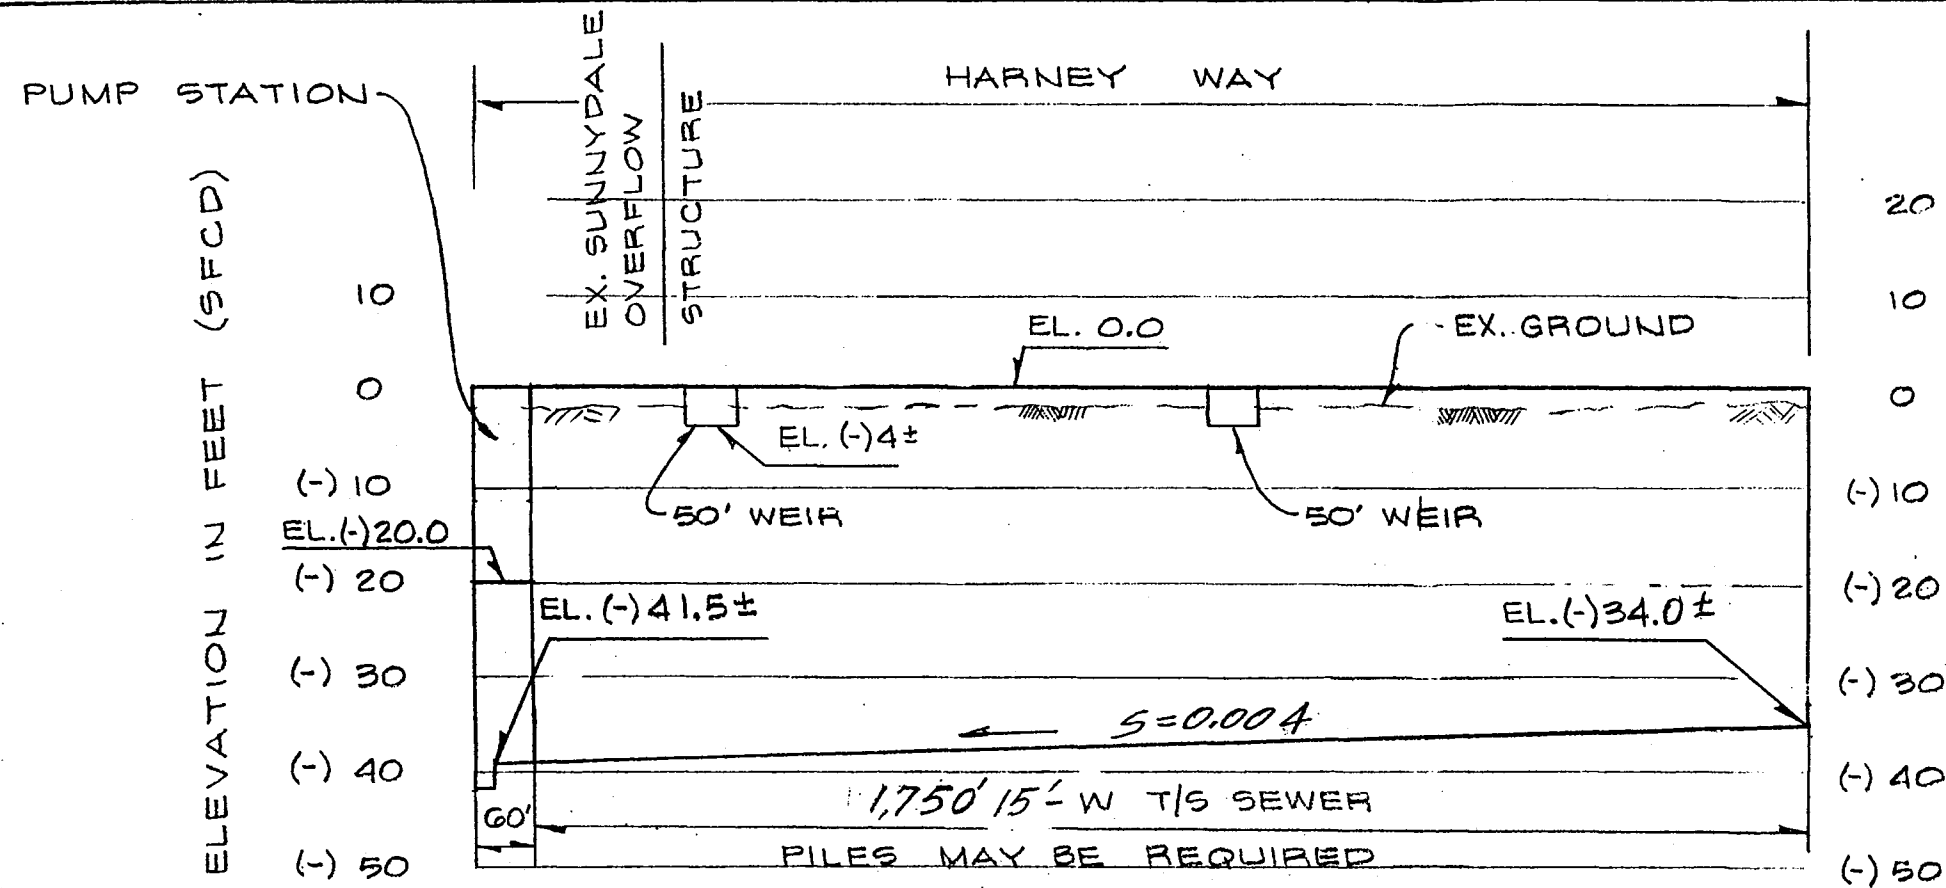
PROFILE & SECTIONS OF REVISED APPARENT BEST ALTERNATIVE SUNNYDALE TRANSPORT/STORAGE FACILITIES
